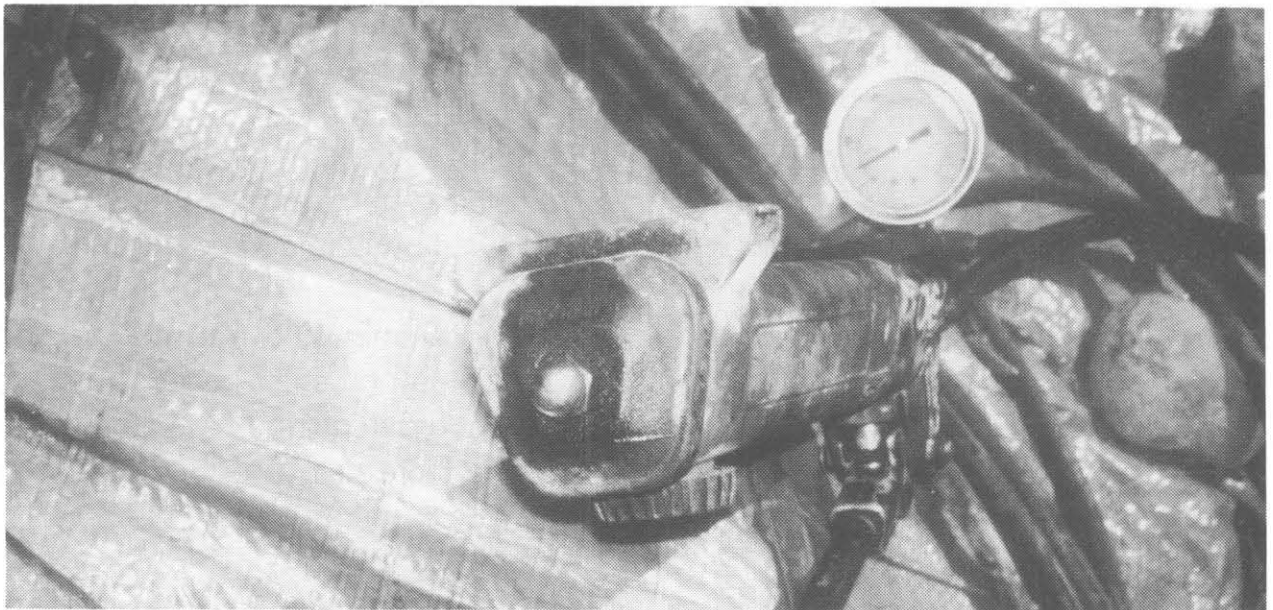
Adjustable Pressure Pump for Fuel Setting on ICE Hammer
